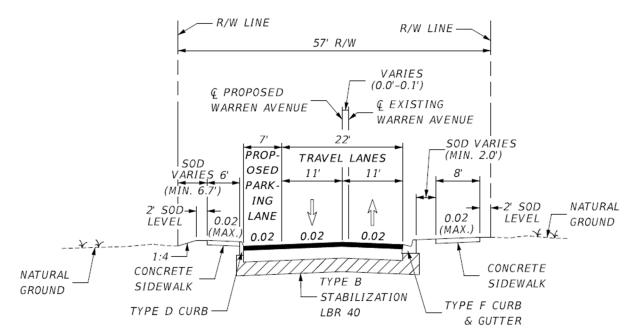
Alternative 2 Typical Section from 760 ft East of Lemon Lane to 700 ft West of Milwee Street
